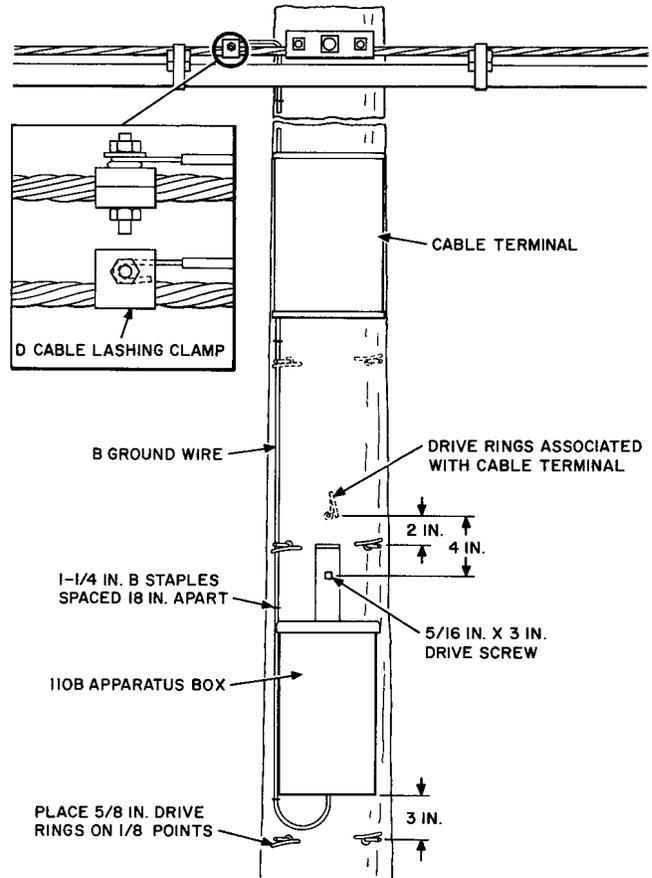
Installing 110B Apparatus Box at Pole Mounted Terminal Location
